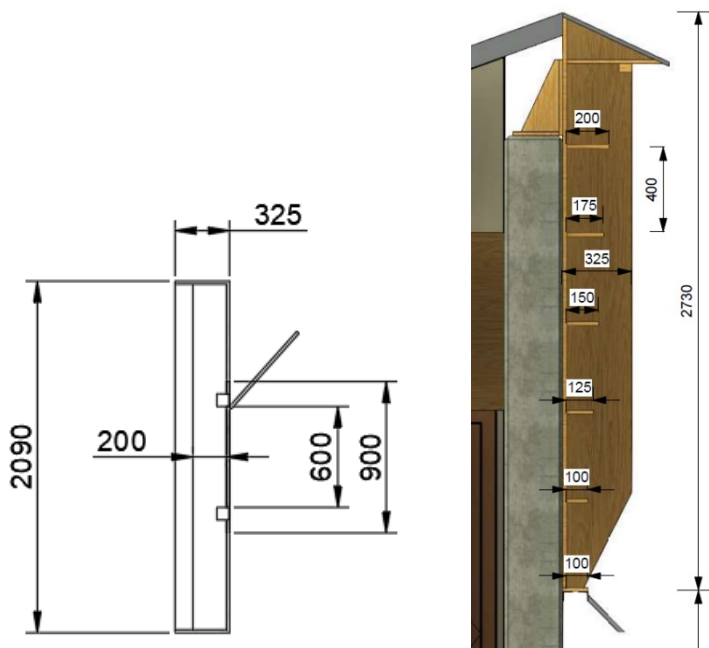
Nesting Cabinets: Plan and Side Views
